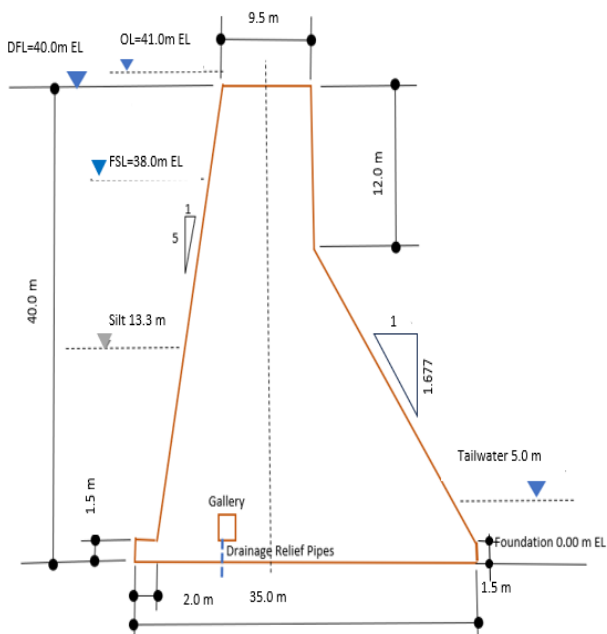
Typical cross-section through of the main section of the Existing Dam
